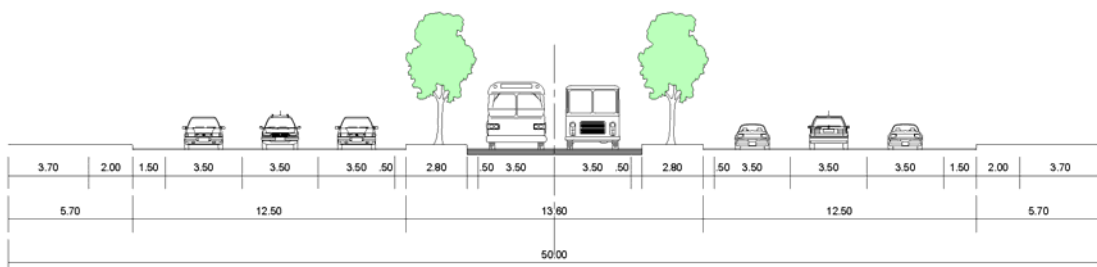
Planned Cross Sections of Rod. BR-316
